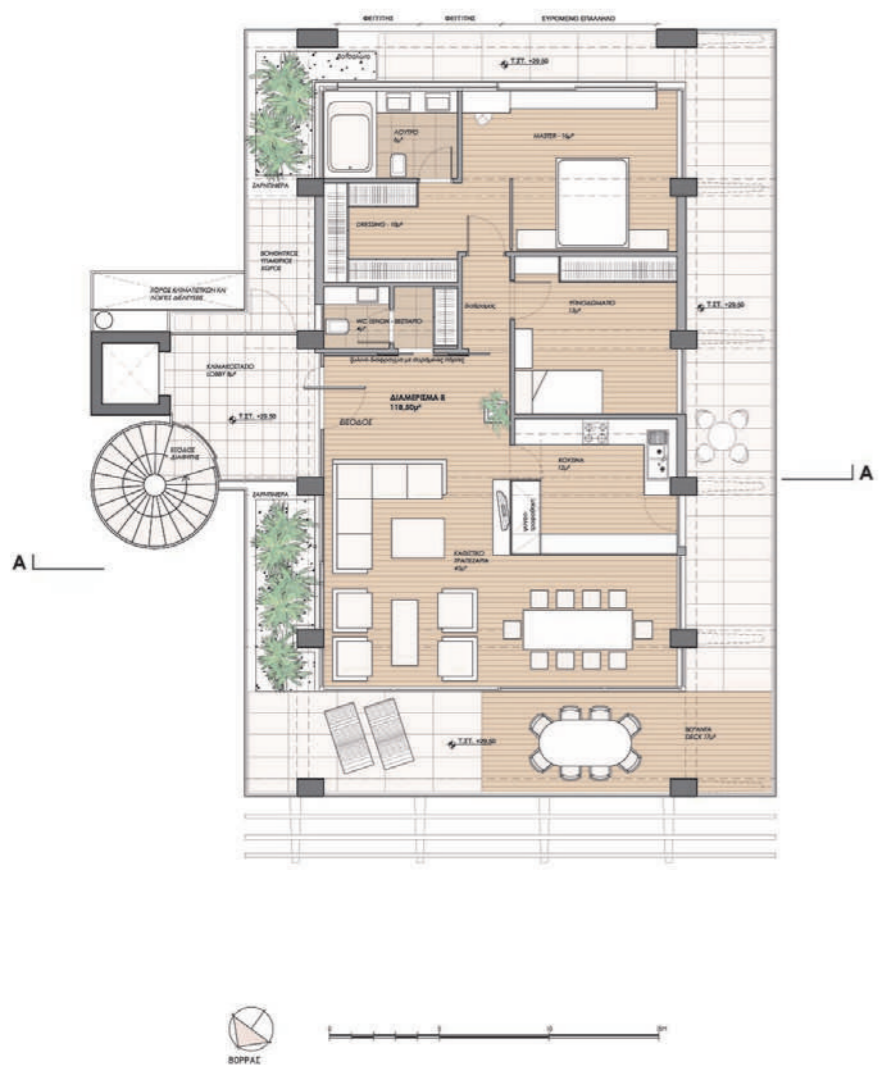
Typical floor plan after intervention. © A. Michael's archive.
